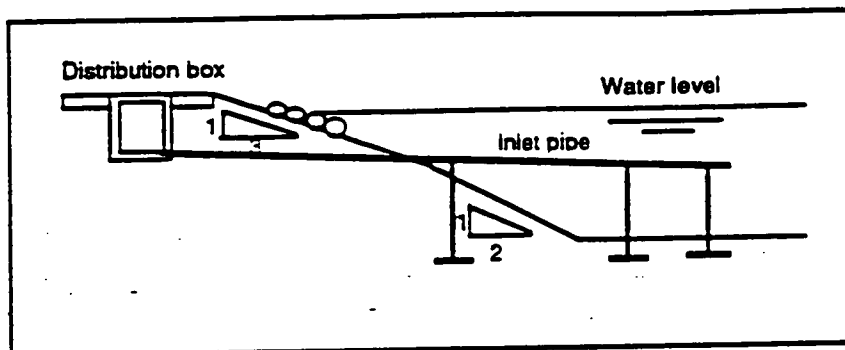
A connection plan between WSPs via outlet chamber and pipe by Mara (1976).
